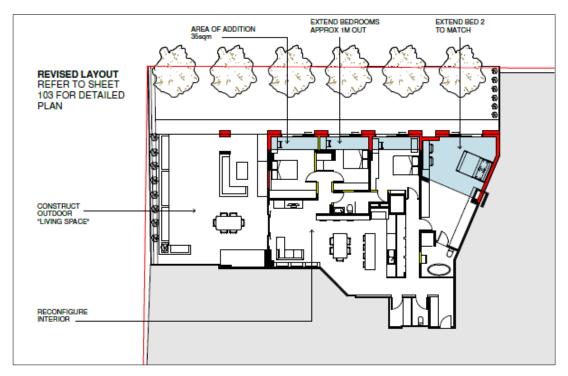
Proposed addition and internal reconfiguration to accommodate the extension
